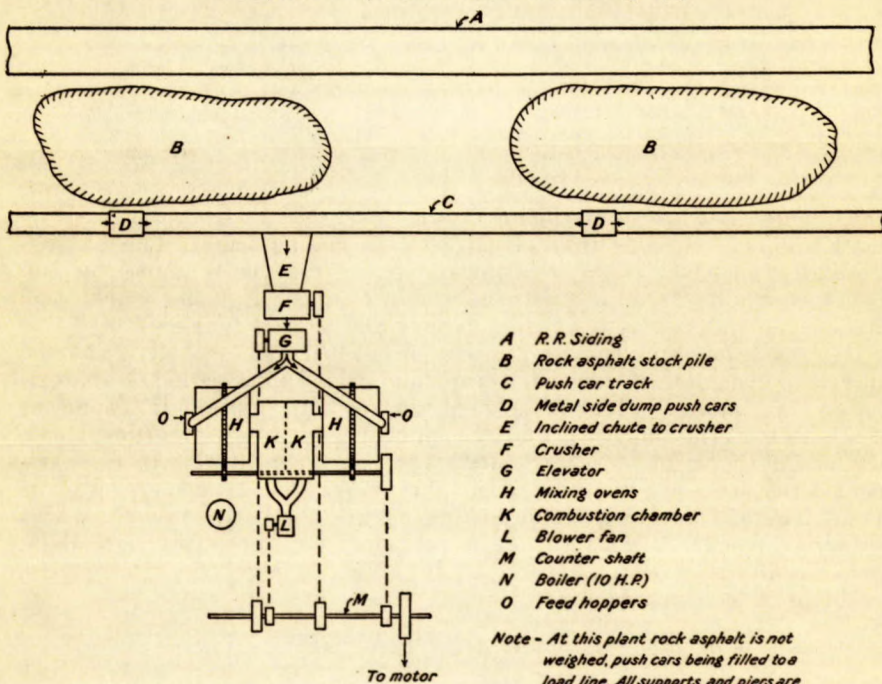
Diagram illustrating installation of internally heated mixing plant at Fallis, Texas. (Dozier Construction Company.)
